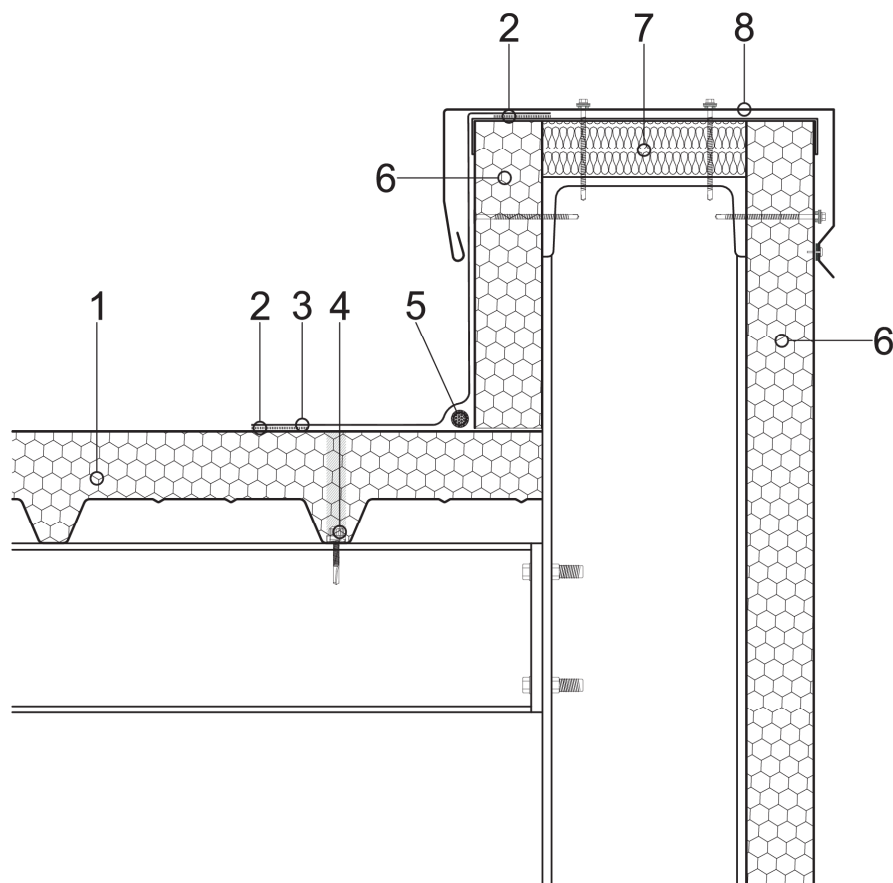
DETAIL OF SIDE CONNECTION FOR ROOF WITH SLIGHT SLOPE
